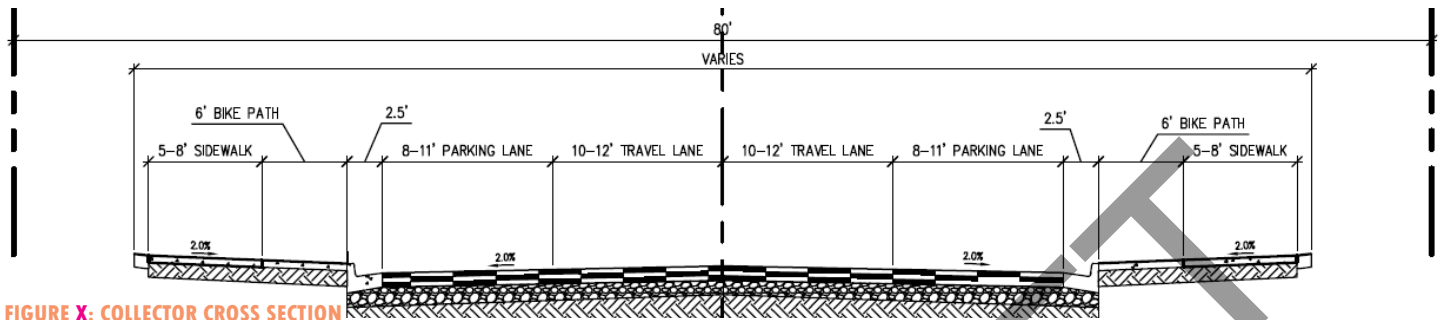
FIGURE X: COLLECTOR CROSS SECTION WITH ON-STREET PARKING
